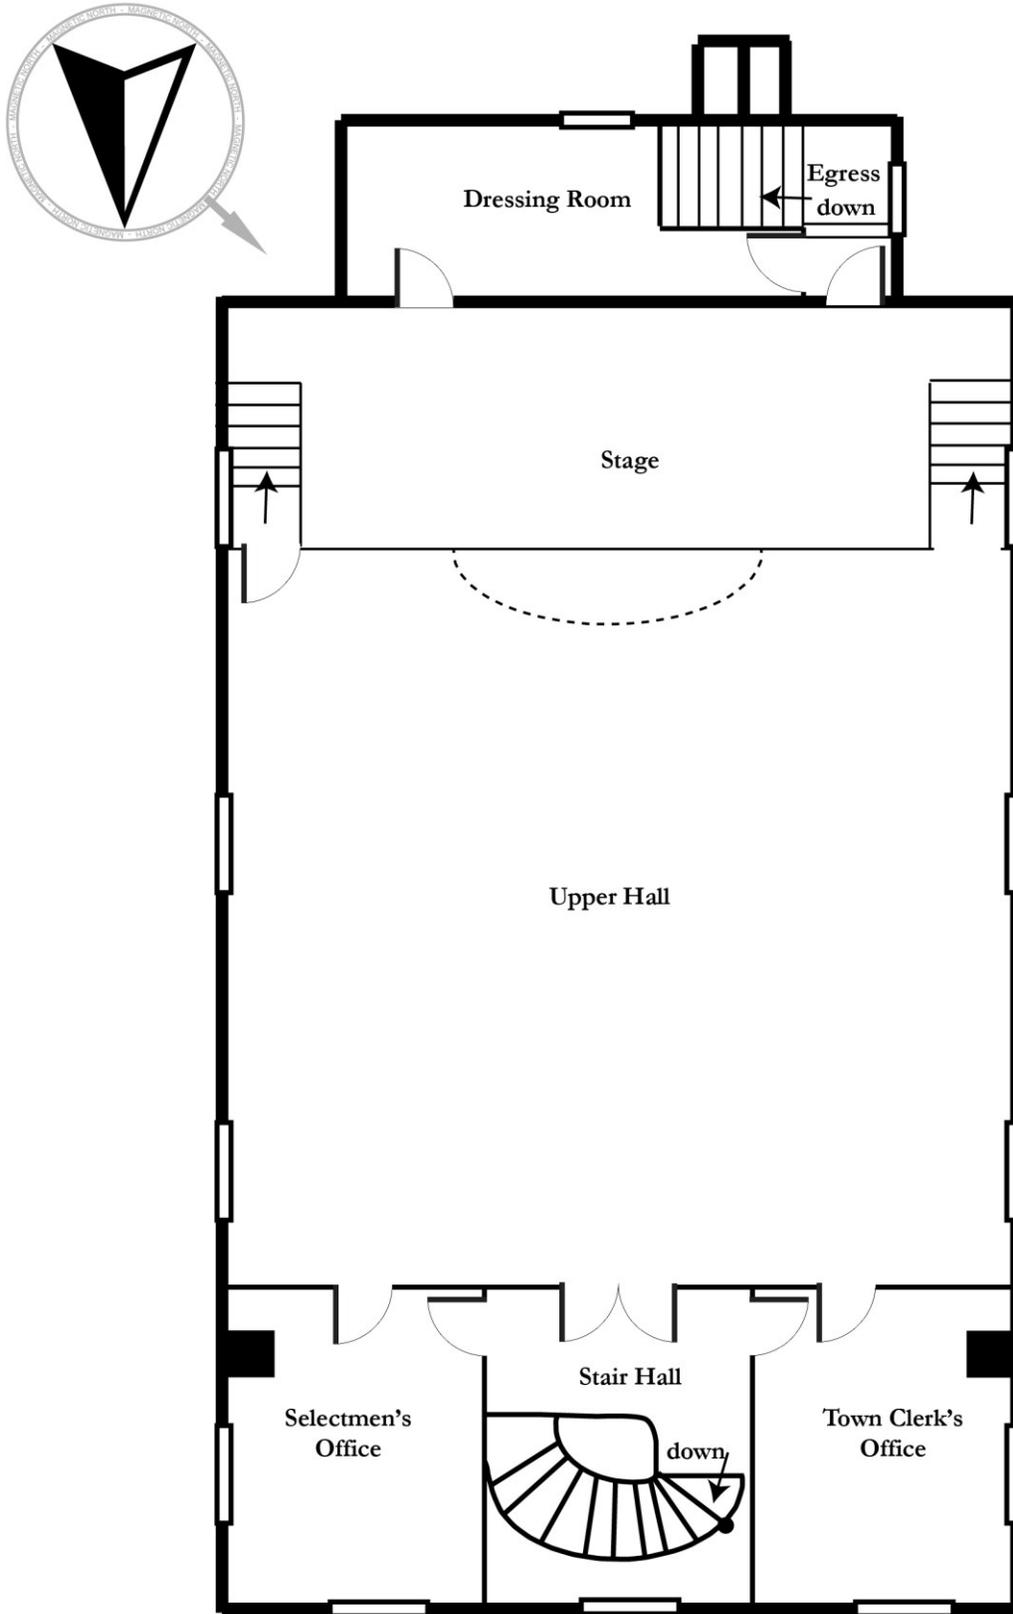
Approximate second-floor plan (not to scale). *Note project north is oriented down
